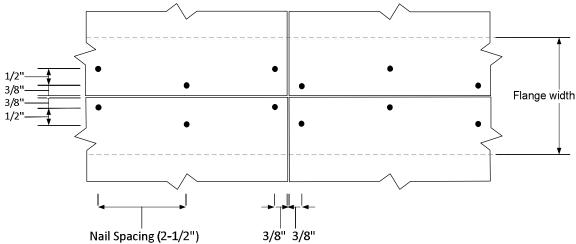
Staggered nails when the nail spacing is 2-1/2 inches o.c. at adjoining panel edges (not to scale)
